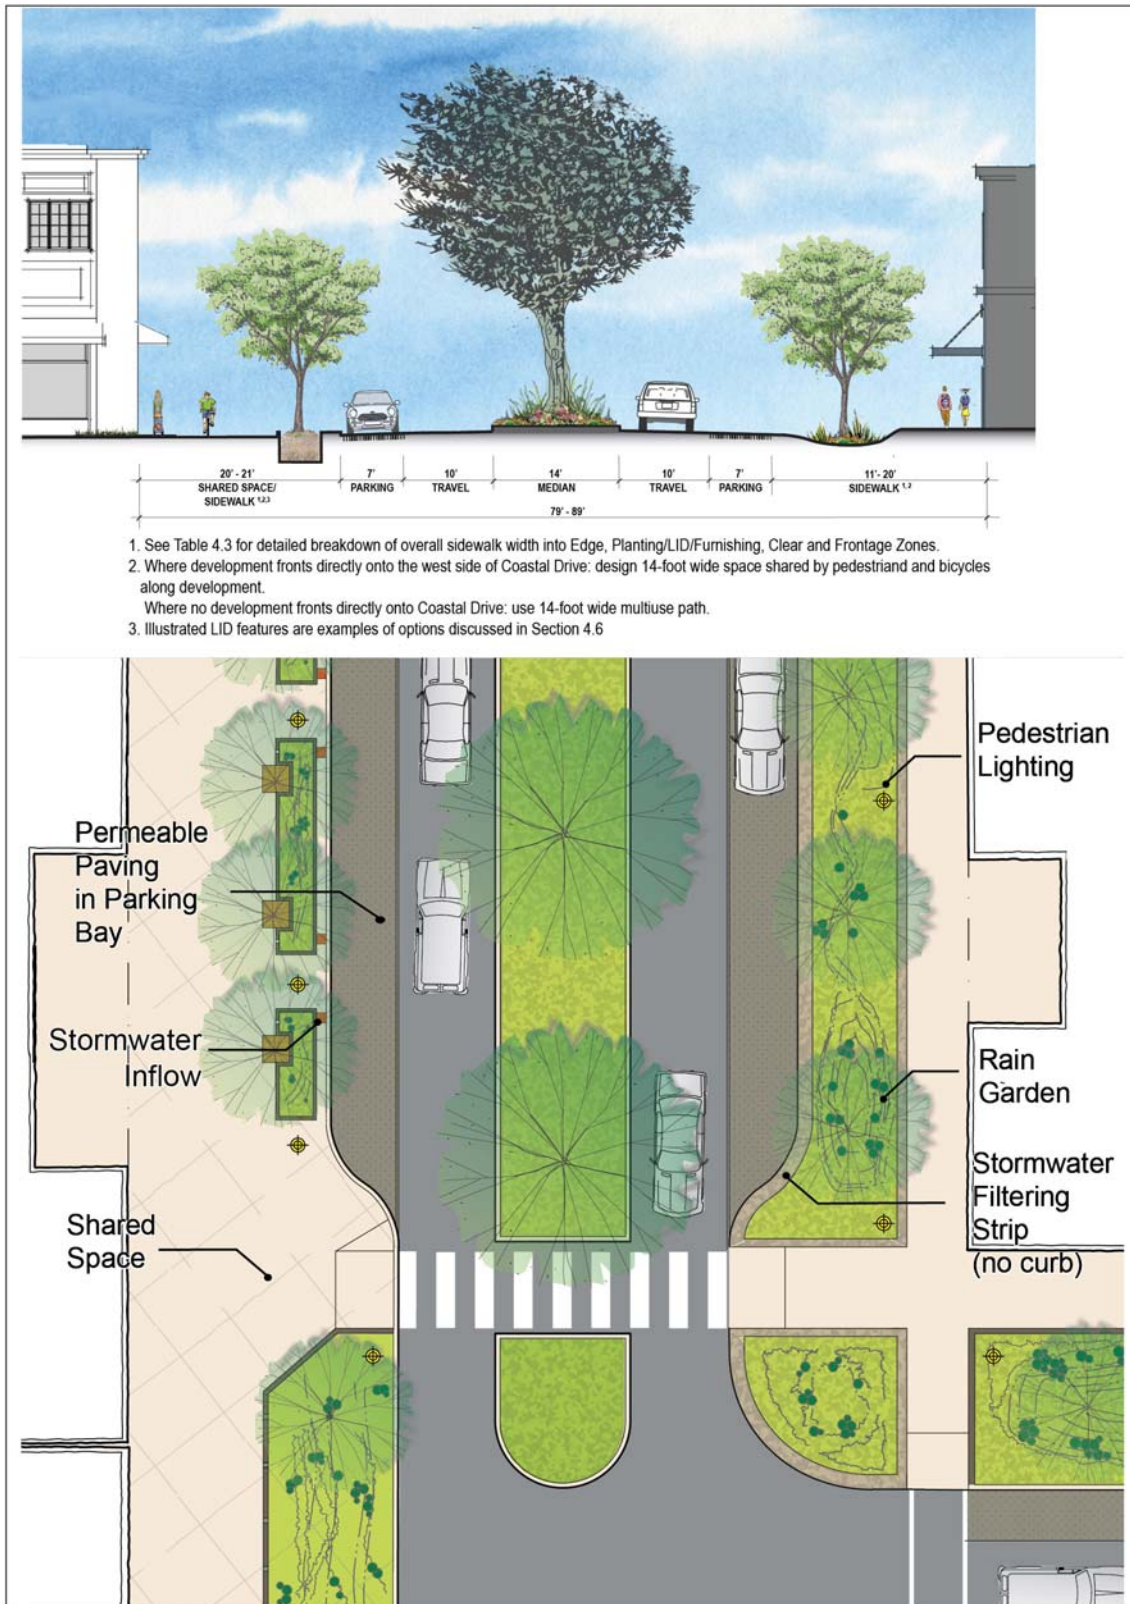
A MIXED-USE STREET/REDWOOD AVENUE ALTERNATIVE 1 (WITH STORMWATER PLANTERS)
